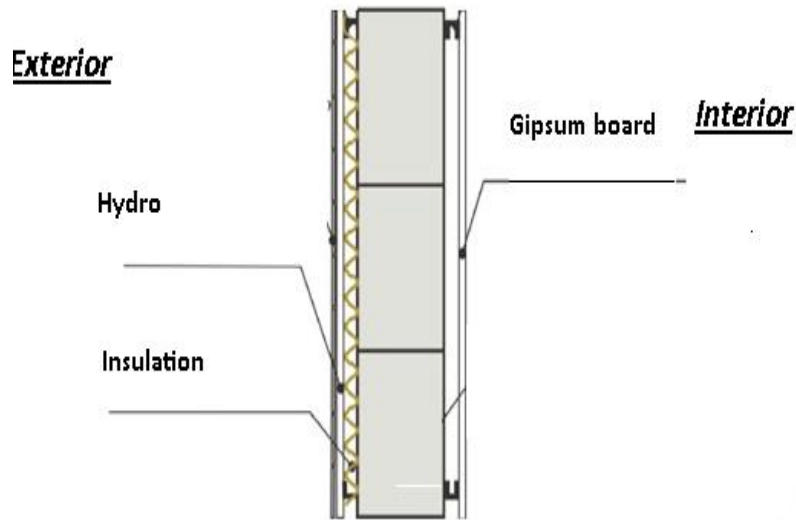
Suggested scheme of insulation of external walls with basalt non-woven bats.
